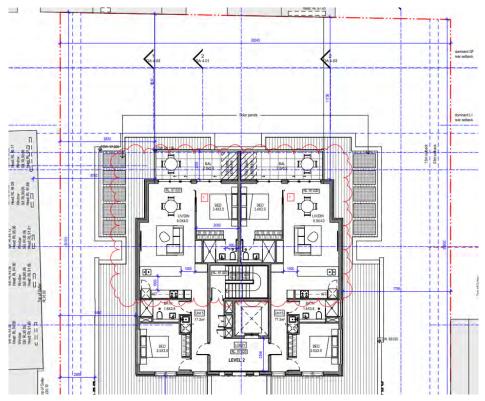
Proposed Level 2 floor plan – DA-88/2019/A
